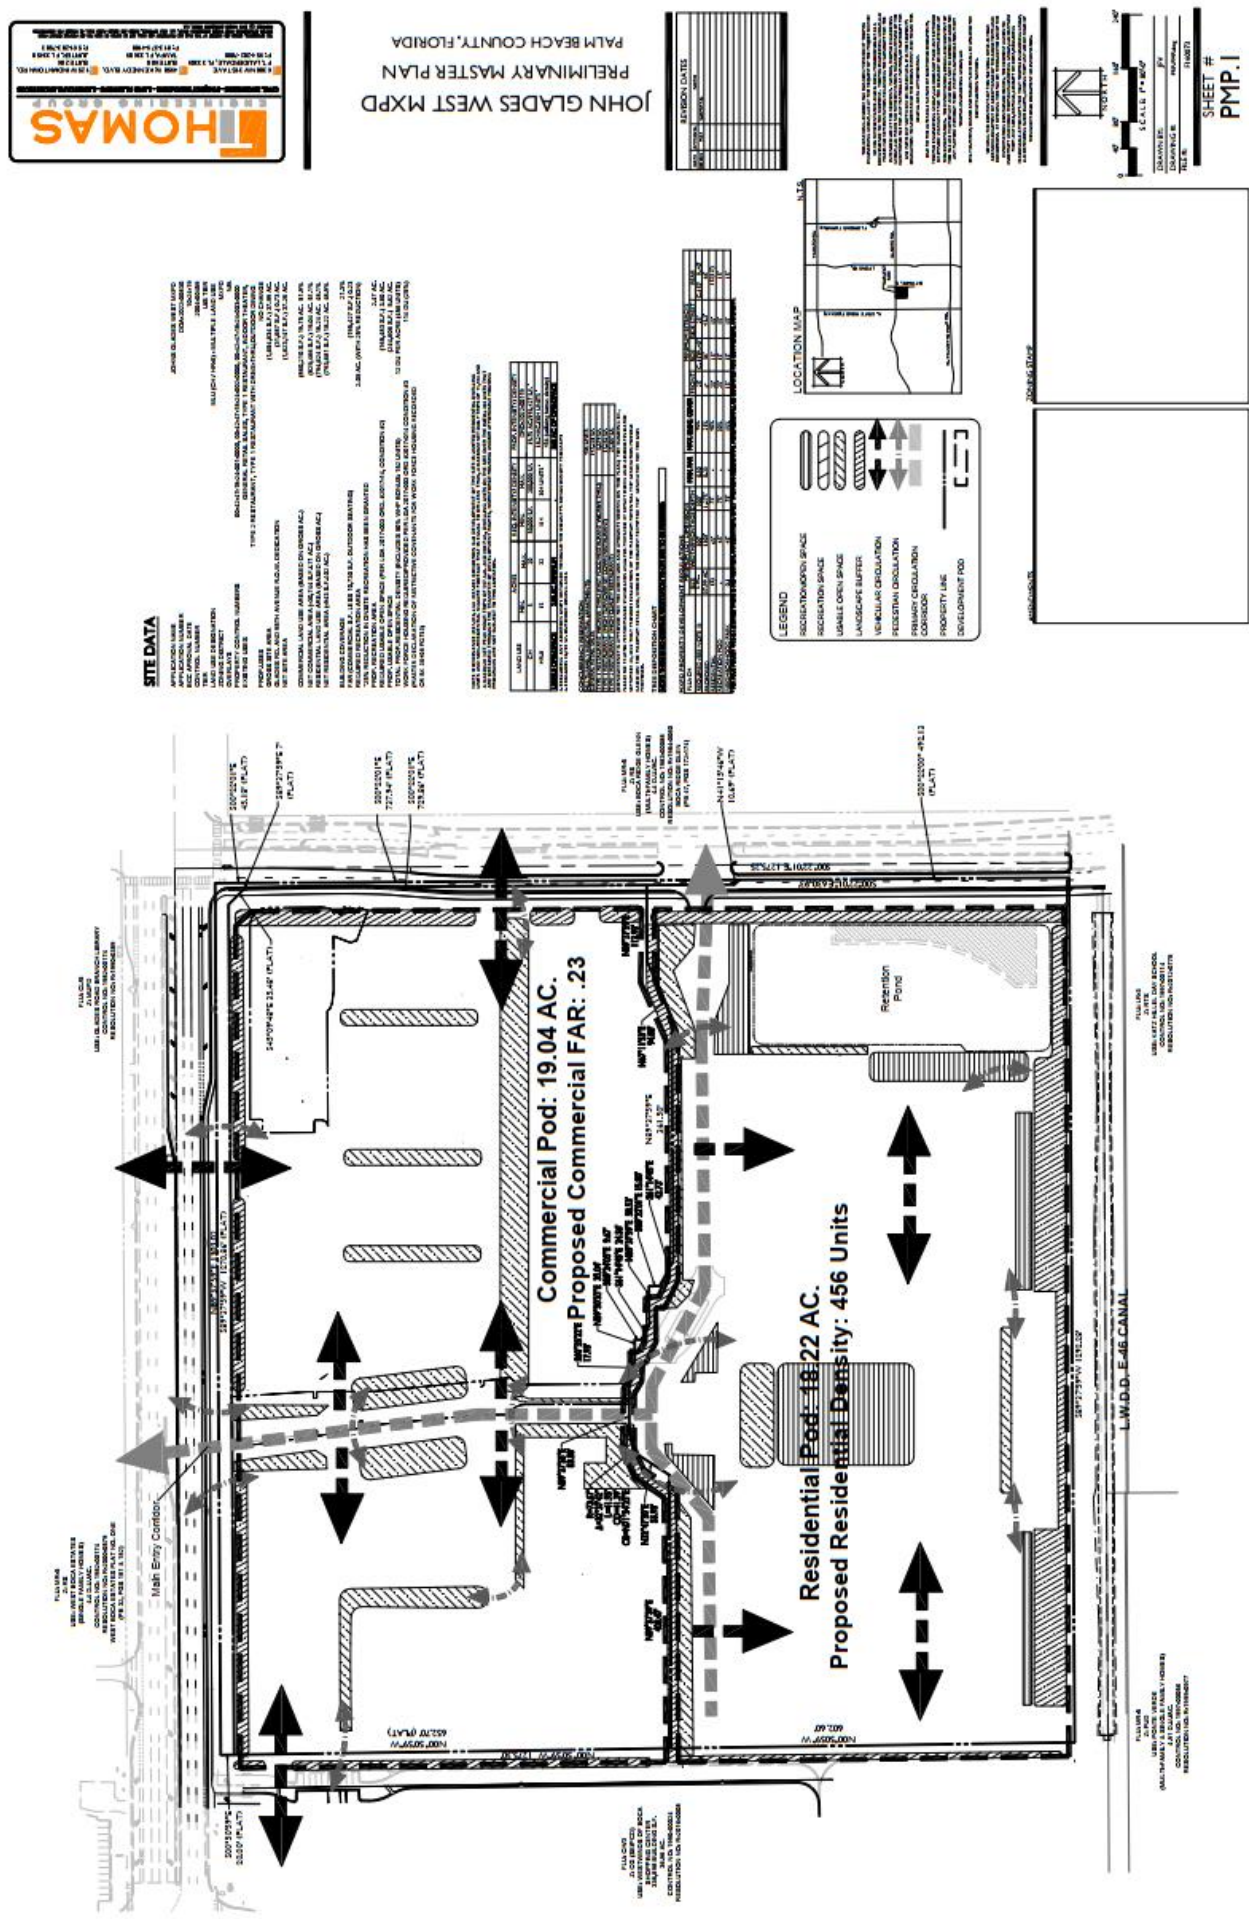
Preliminary Site Plan (PSP-1) dated October 13, 2022
